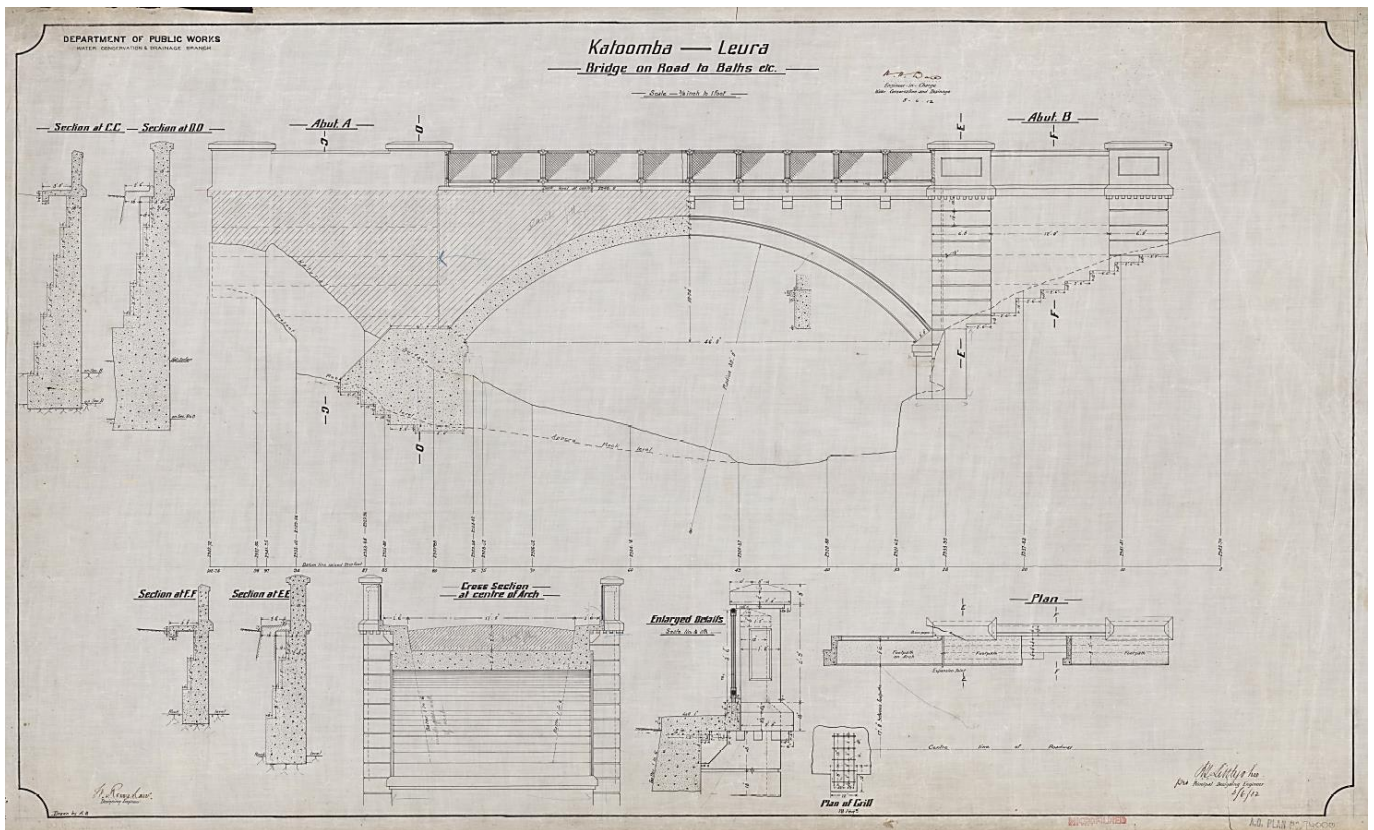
Chelmsford Bridge, Leura - Plan Elevation, Public Works Department 1912. (AO Plan 74000)
